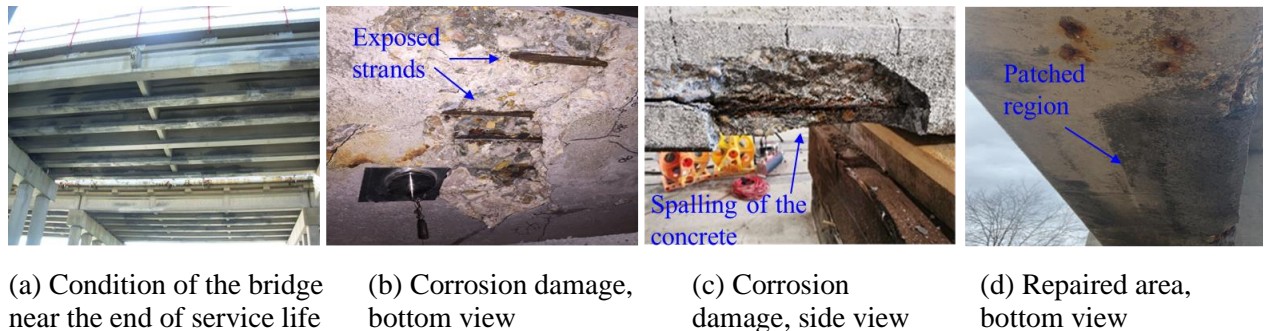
Corrosion-induced damage in I-section bridge girders at different locations.
